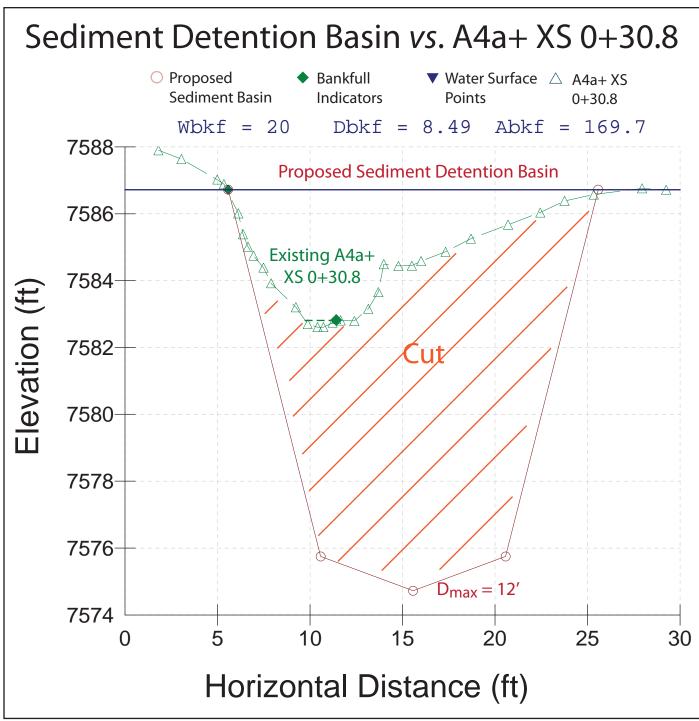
The proposed sediment detention basin located at the existing A4a+ cross-section 0+30.8.
